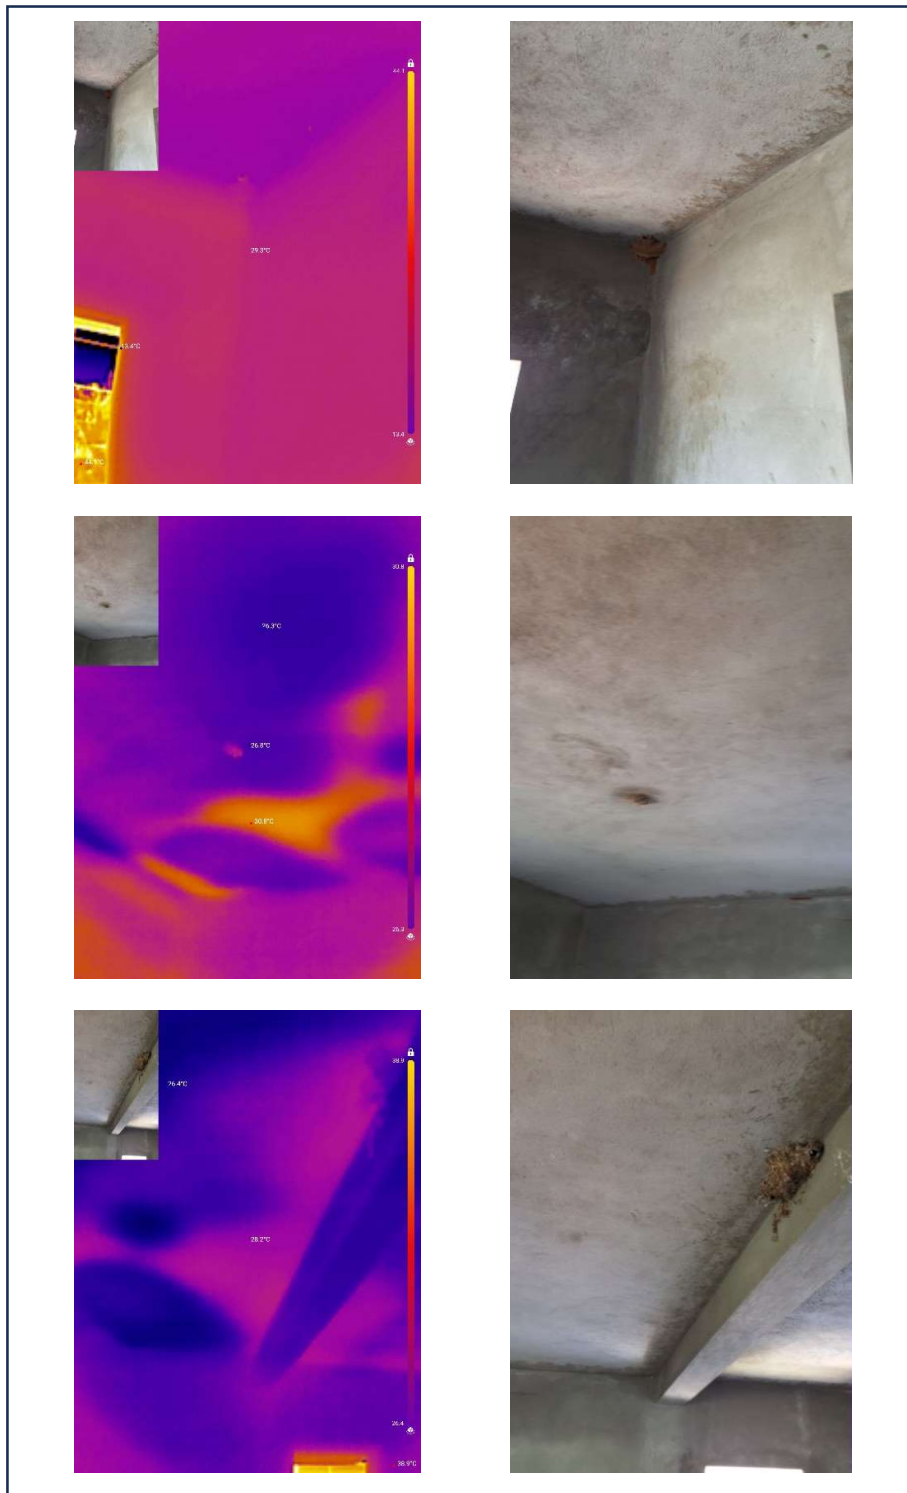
Severe damp patches are observed on the slab due to water stagnation on the surface and ingress of water into the concrete. Prolonged exposure of raw concrete to weather has led to moisture penetration and development of cracks. – 2nd floor
